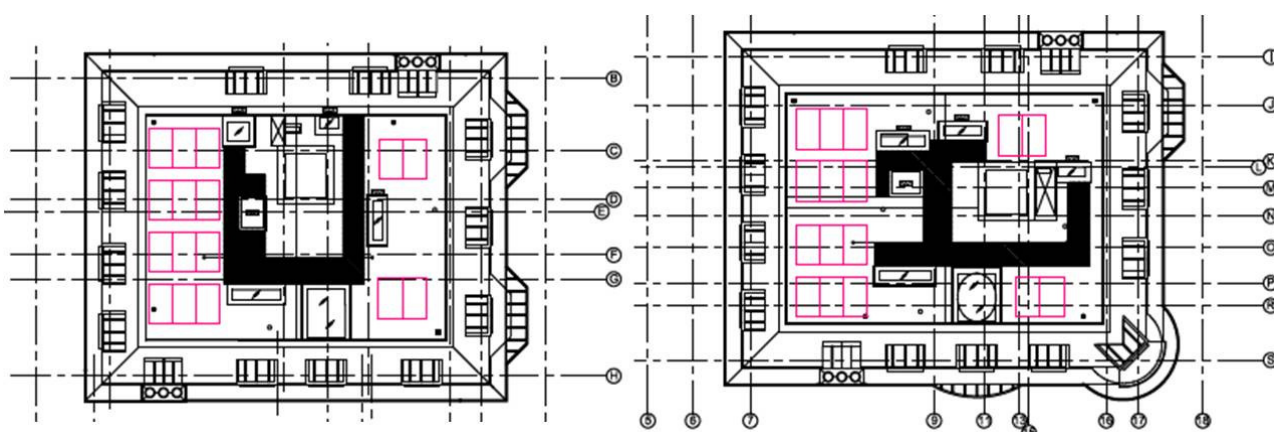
73 & 75 Indicative roof plan showing location of PV.
